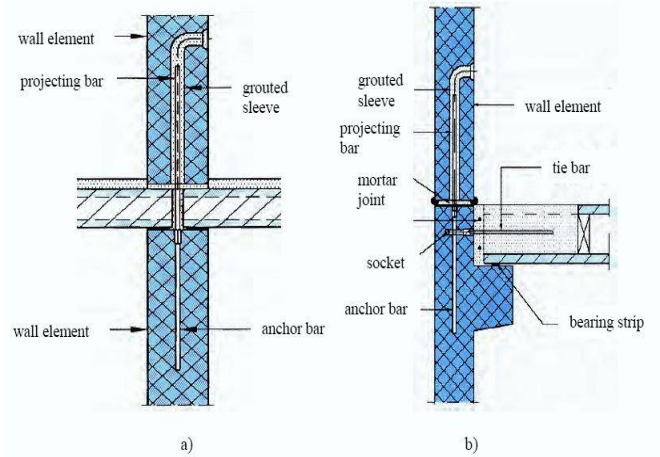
wall to wall connections with projecting bars in grouted sleeves, a) interior connection, b) exterior connection
